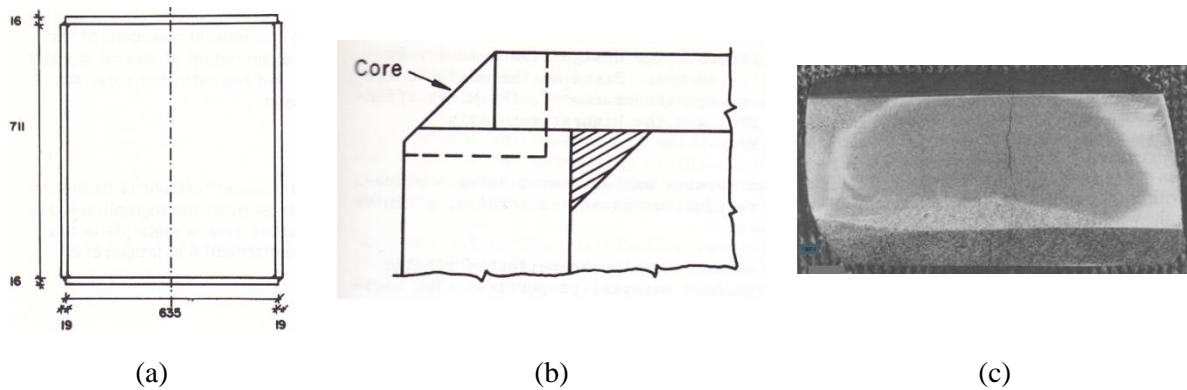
Location of fatigue cracks of Gulf Outlet bridge (Fisher, 1984): (a) cross section of one of the deck's box girder, (b) core extracted and (c) visible location of the crack.
